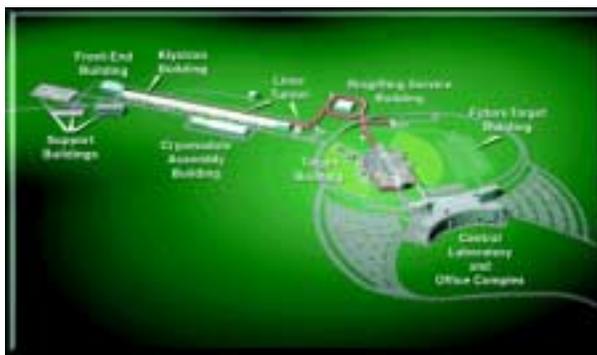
Spallation Neutron Source site plan showing the front end, linac, accumulator ring, target, instruments, and central lab/office and other support facilities.
